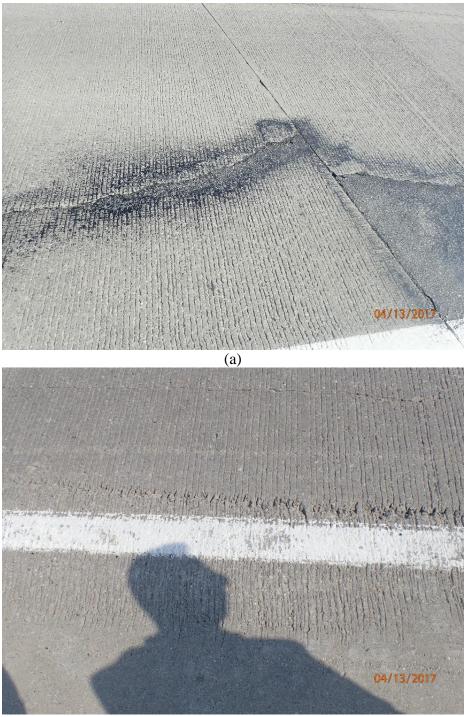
Pavement at LC Site 4 – US 218 in Henry County
